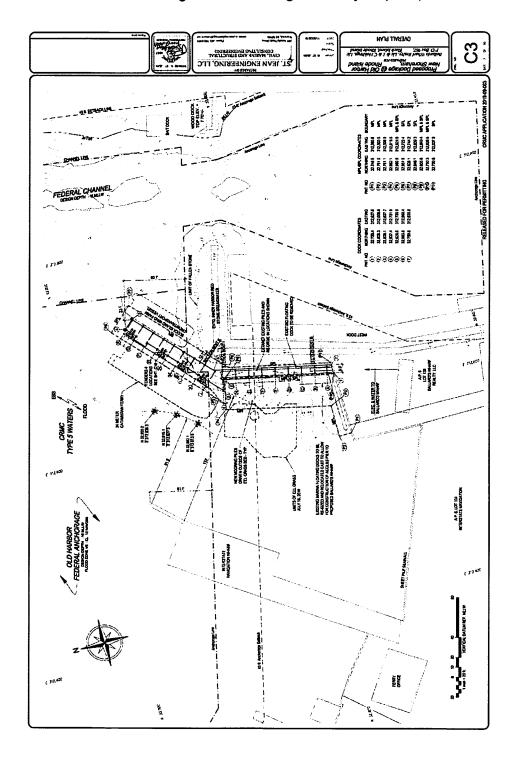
Proposed Ballard's Wharf Pier – Shown in Grey
